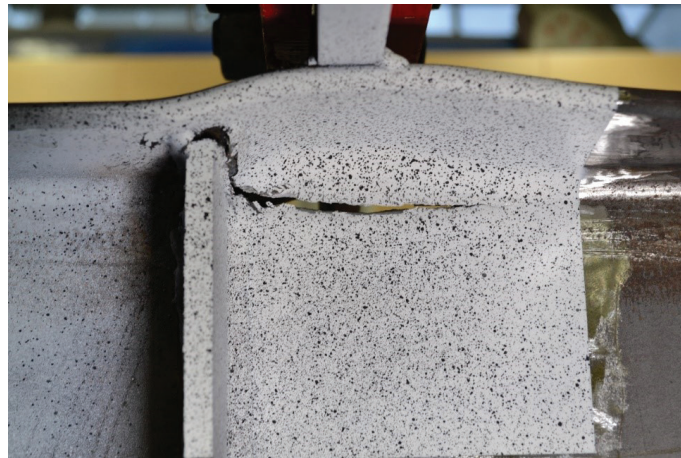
W12x26 ST-E2 after testing with weld and web fracture.
